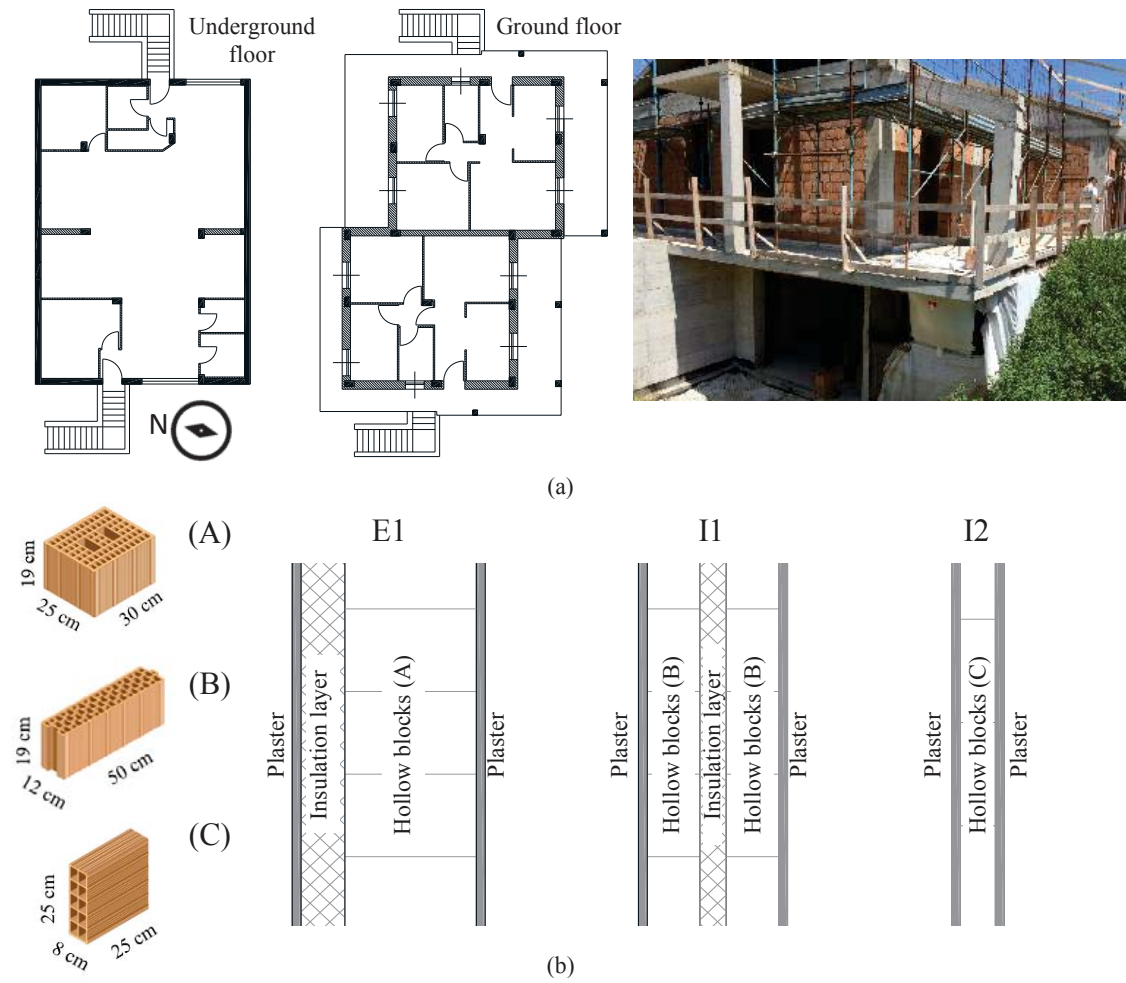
Real case study: a) building floor plans and picture during construction, b) infill masonry wall typologies.
